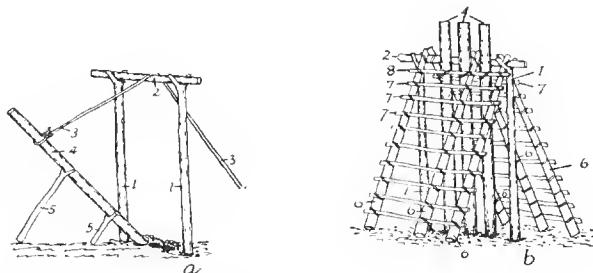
a*, method of raising posts into position by rope passed over scaffolding cross beam; *b*, continuation of construction: Scaffolding for middle section of house: 1, forked uprights (*to'o manga*); 2, horizontal cross bar (*la'au fa'alava*); 3, rope; 4, main supporting posts; 5, forked struts; 6, oblique pairs of timber; 7, horizontal cross pieces (*papani* or *teleteleanga*).
